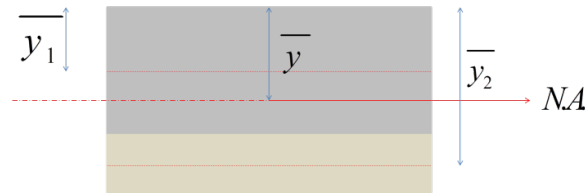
Cross Section of the Specimen as A Composite Beam
